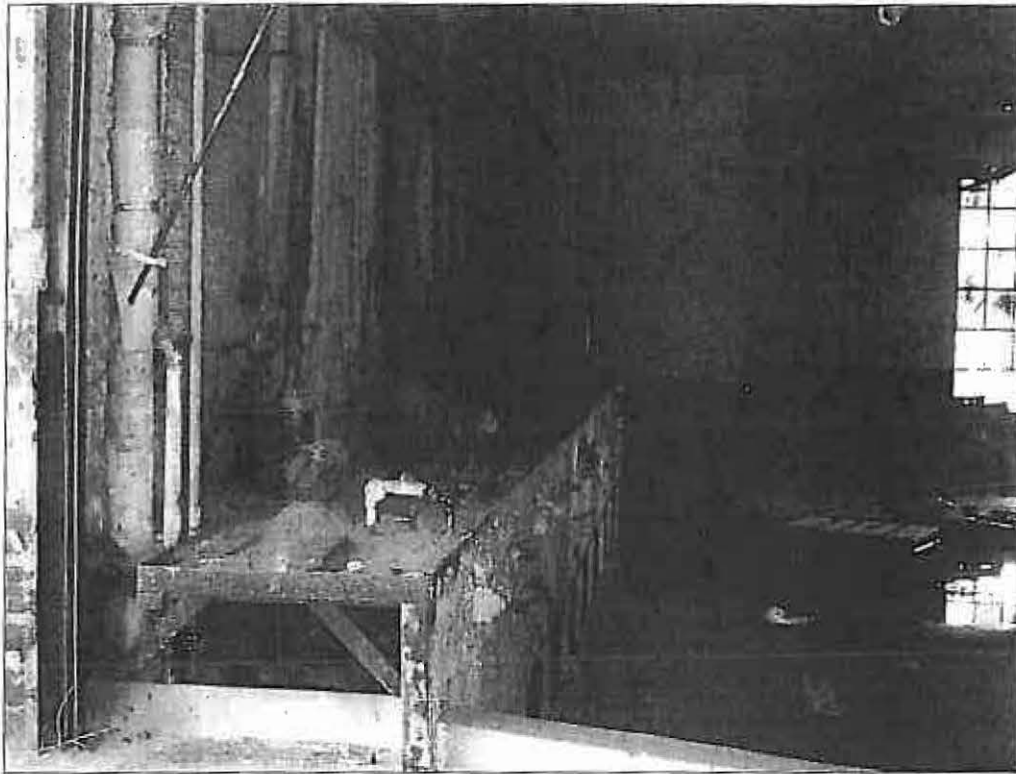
Interior of Building No. 7 showing piping (AOC A-3) along northern wall.
